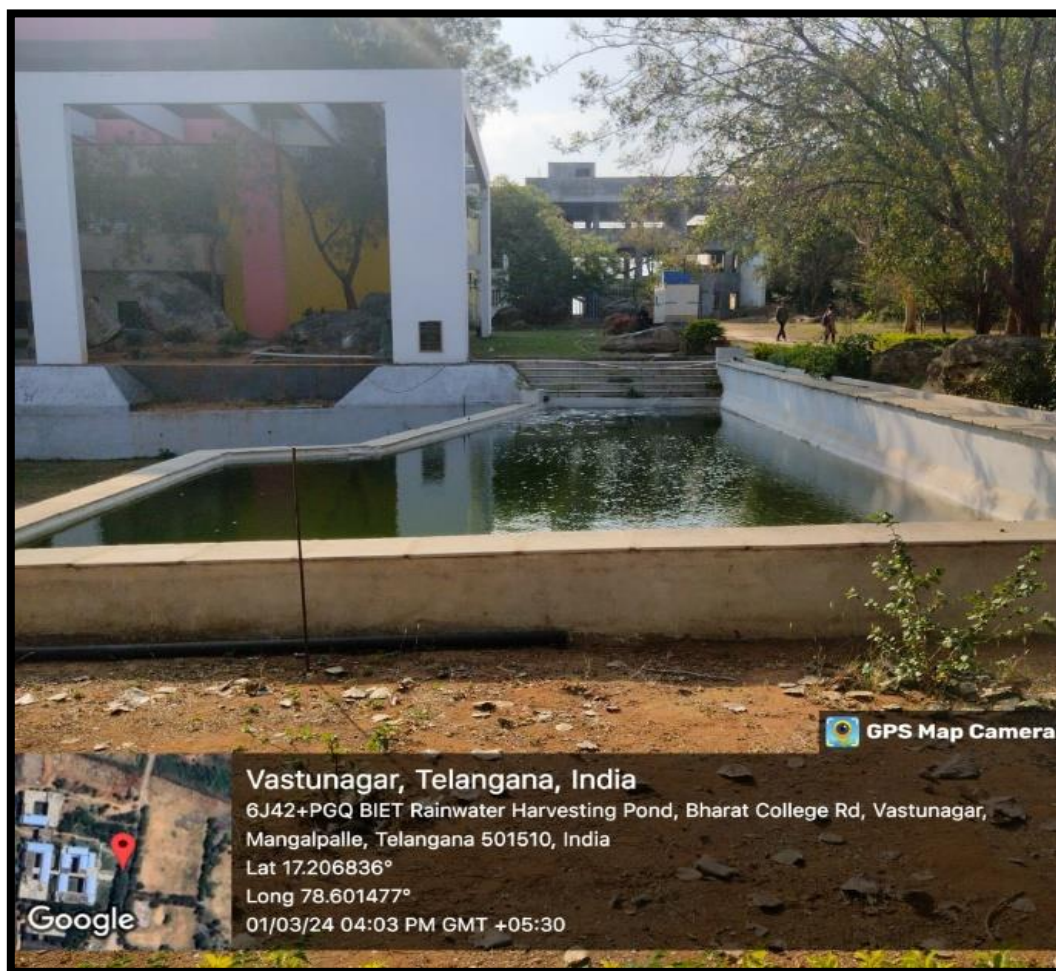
Rooftop rainwater harvesting - storage trench in BIET:
